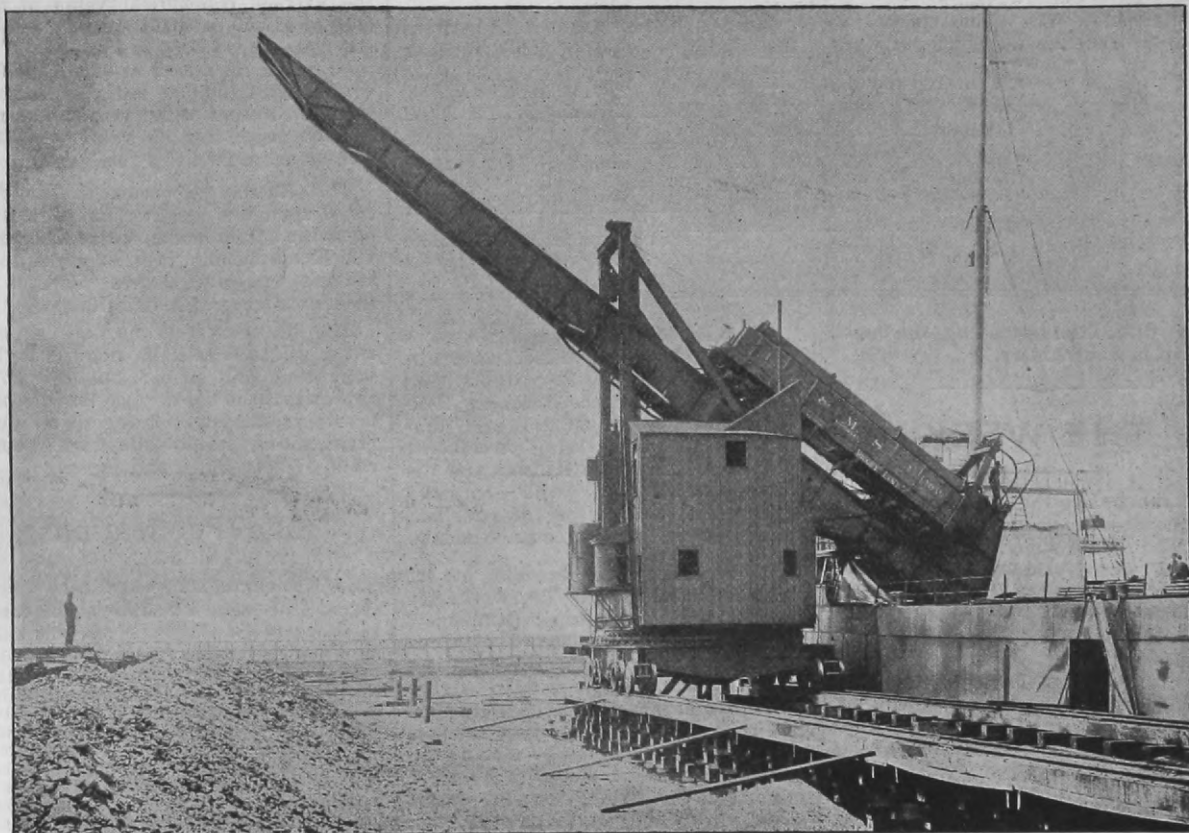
View Showing Bridge Tilted to Dump the Car.
